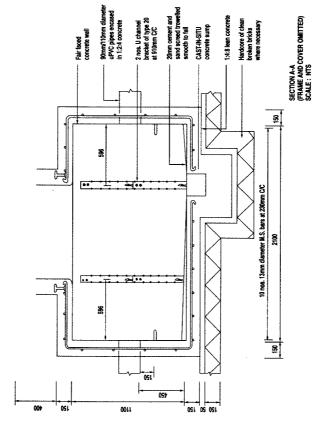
MANHOLE DRAWINGS - TYPE MX2
